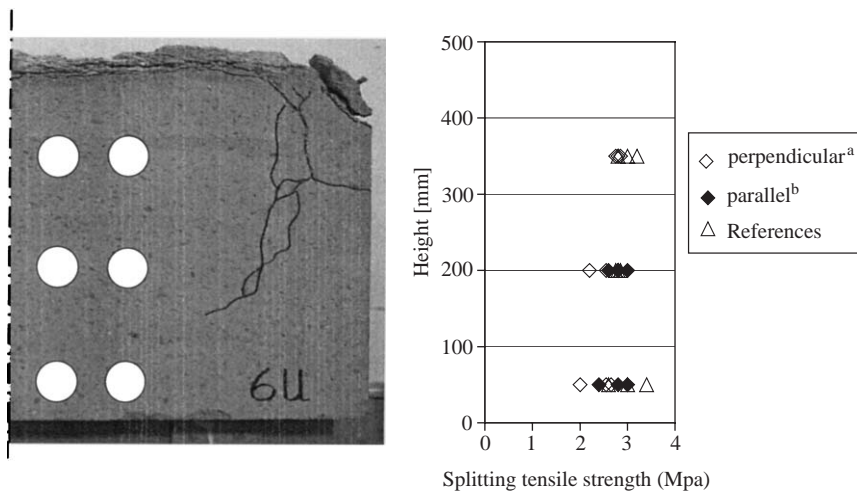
Uniaxial splitting tensile tests, horizontally drilled cylinders, block six. (a) Crack orientated perpendicular to the direction of the loading. (b) Crack orientated parallel to the direction of the loading.
